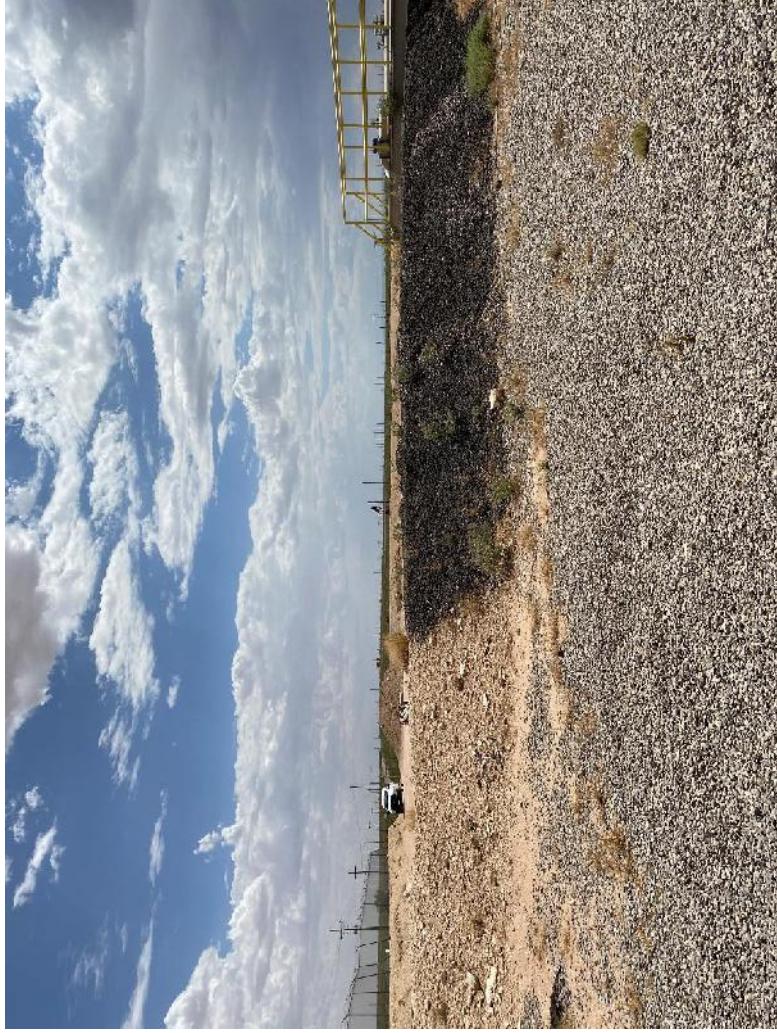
Photograph location 9. August 22, 2024. Central portion of the site, just north of the berm and aboveground piping located north of the release/excavation area facing west. View of aboveground pipelines and supports.
